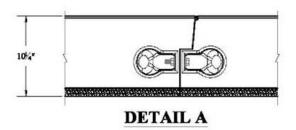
TYPICAL BEAM POCKET DETAIL
